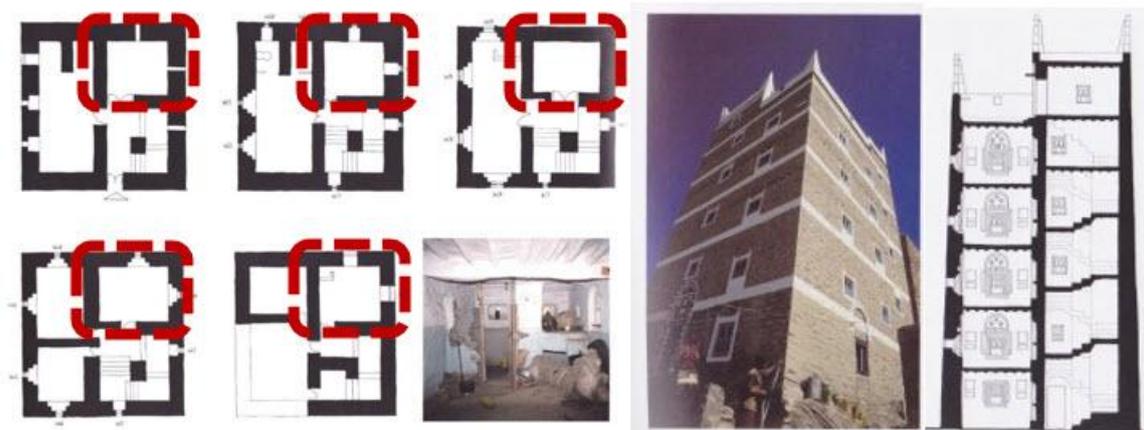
Residential Building 5 Houses in Yafa'a Area.
